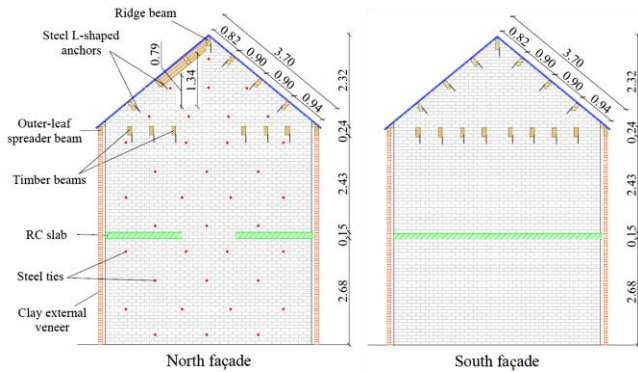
Calcium silicate transverse walls: elevations from outside. Units of m.
